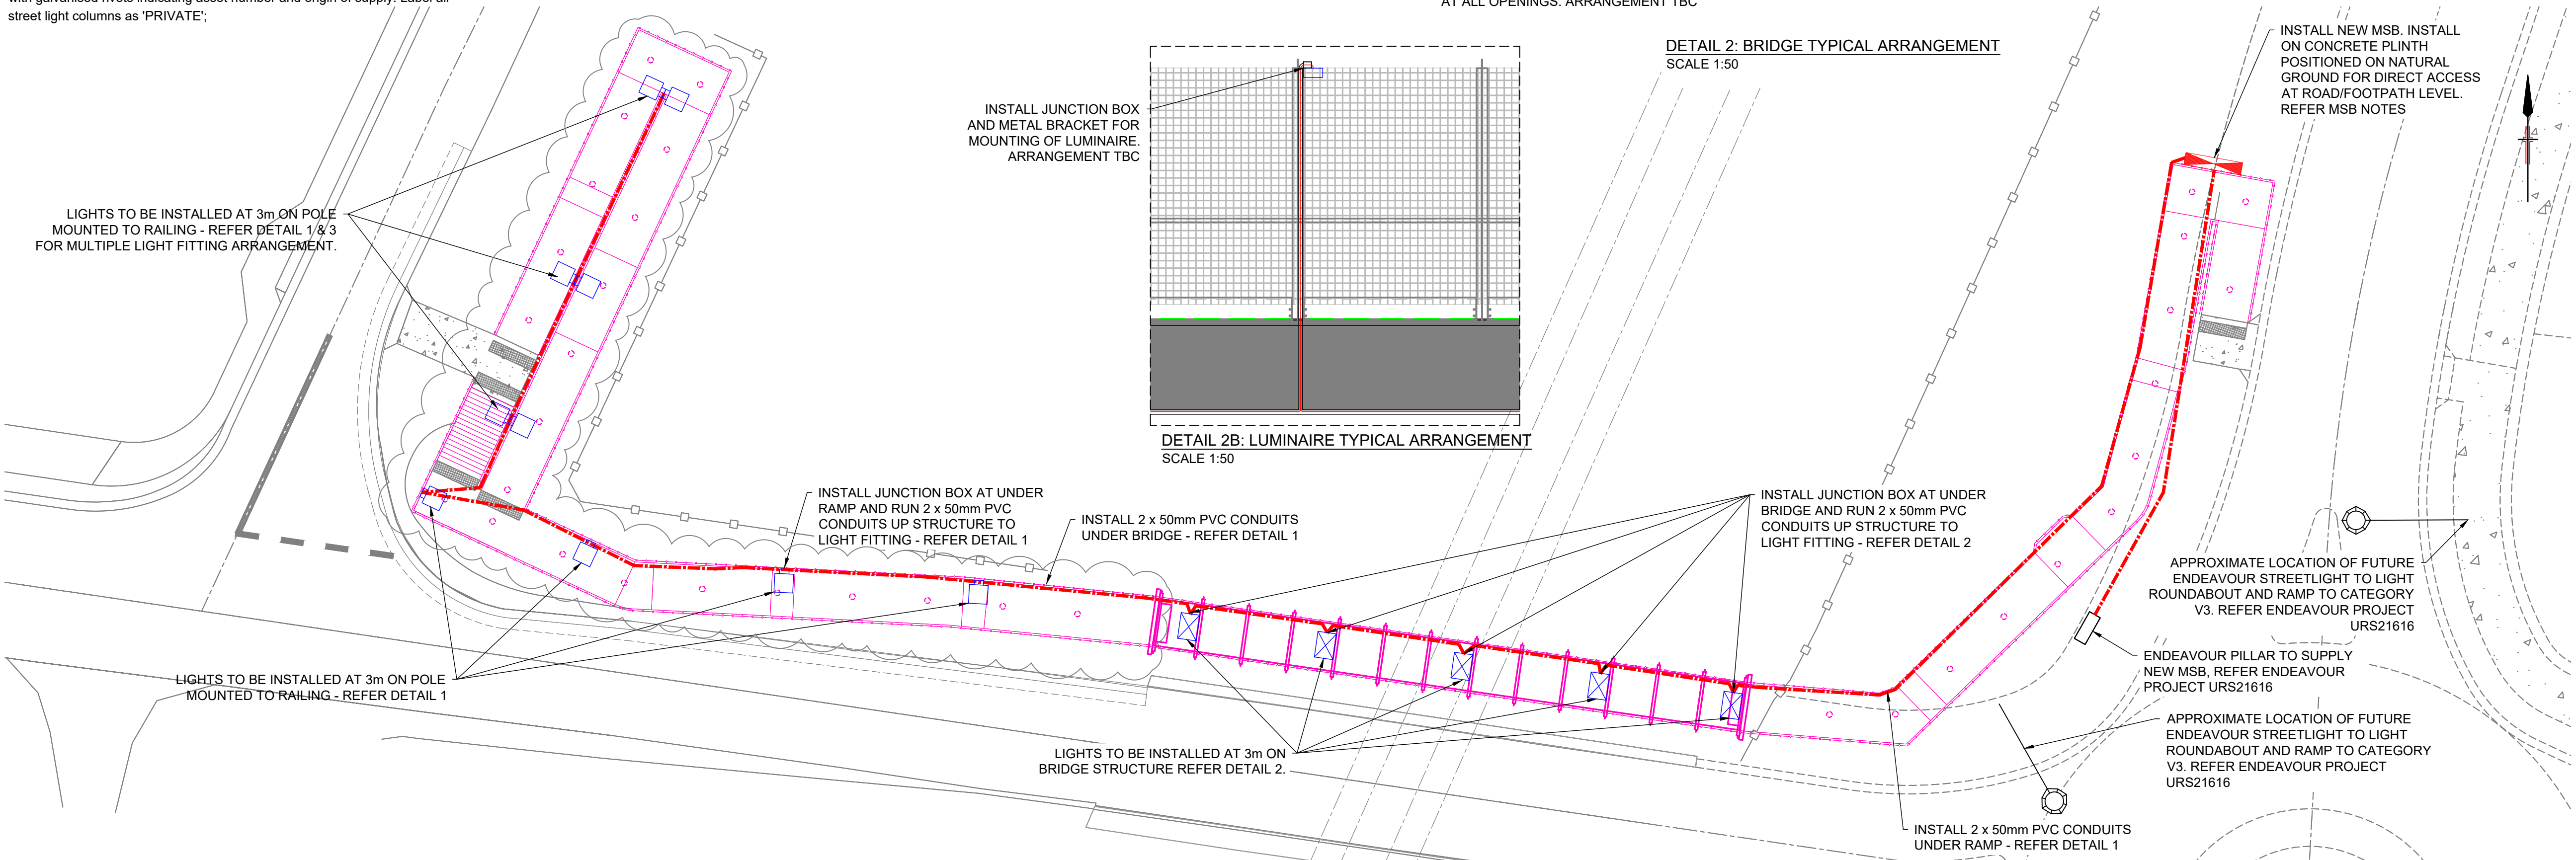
A: LUMINAIRE TYPICAL ARRANGEMENT
